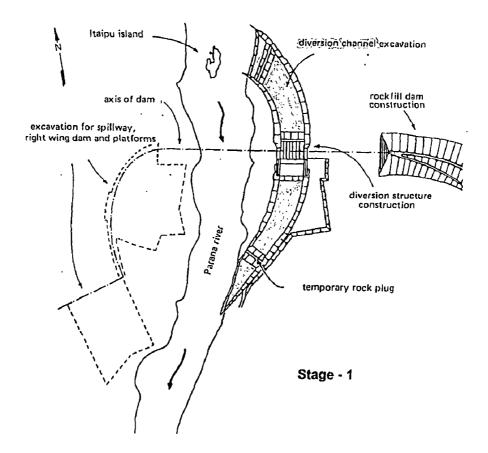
Itaipu dam – River diversion stage - 1
